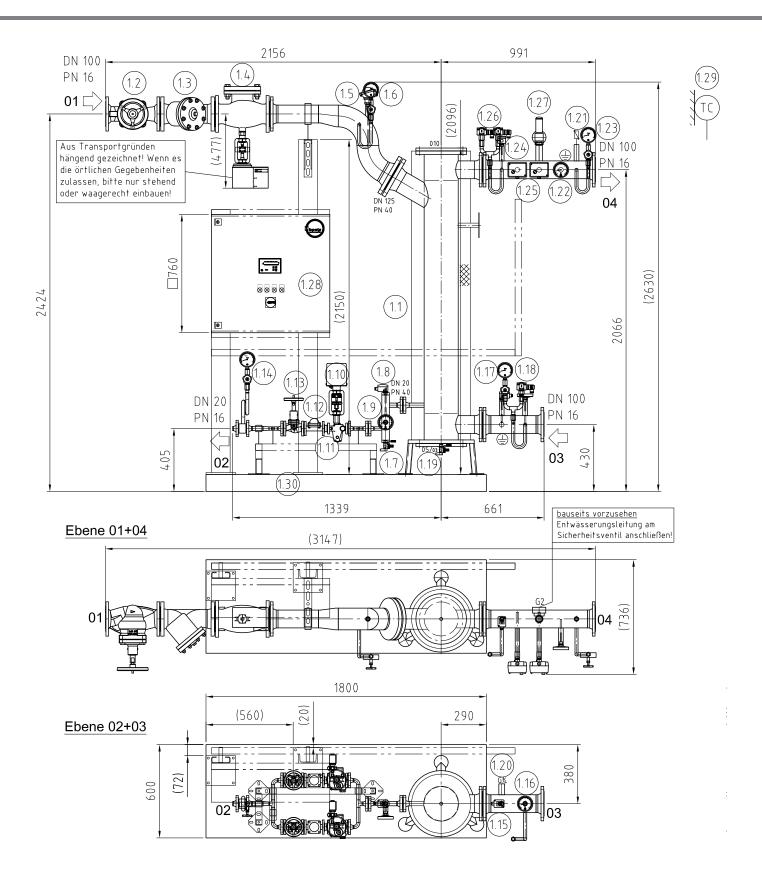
Example assembly plan Steam Terminal "Luxese Instant Heat" with baelz 111
